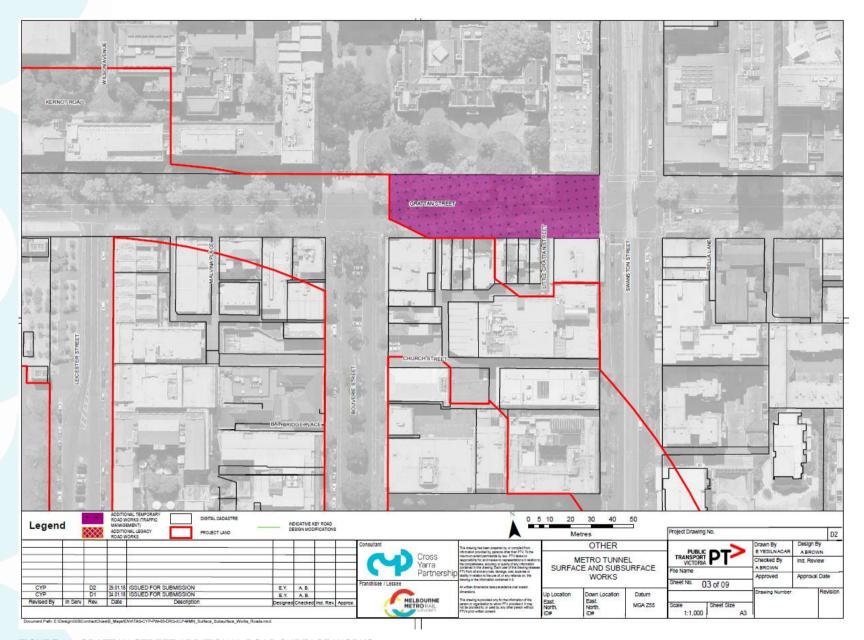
GRATTAN STREET ADDITIONAL ROAD SURFACE WORKS
